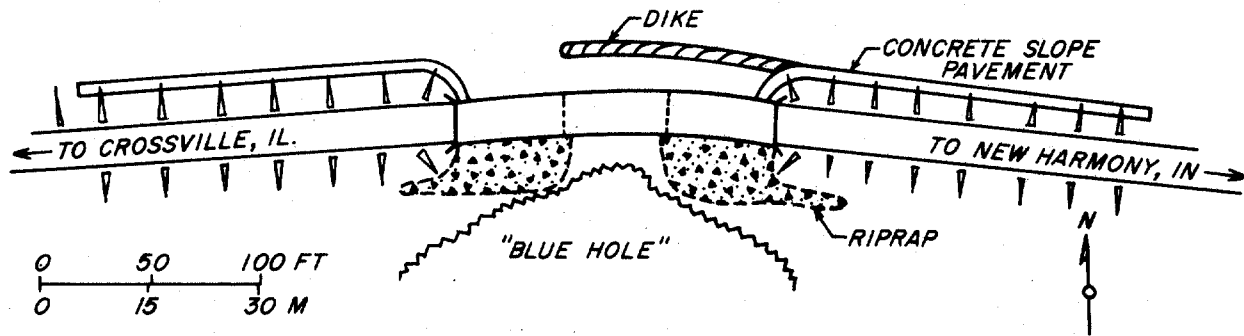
Plan sketch showing countermeasures at relief bridge 3.
